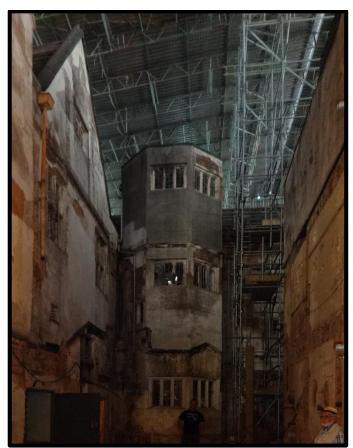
Poltimore House. A substantial fragment of a large 'E'- plan house with a gabled roofline and polygonal turrets in the angles of the wings terminating in belvederes.
